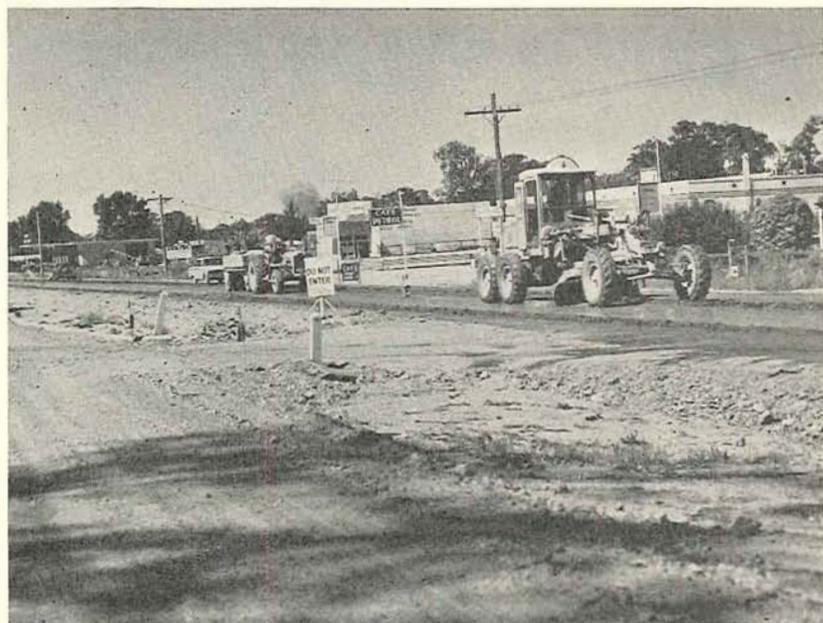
Hume Highway—Construction of the approaches to the new bridges over the Ovens River at Wangaratta.
